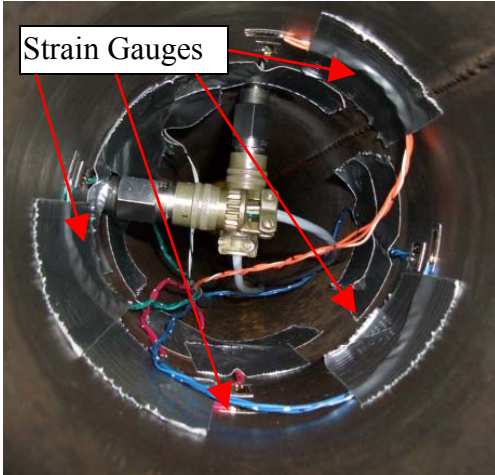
West Well Steel Test Section Strain Gauge Locations.
